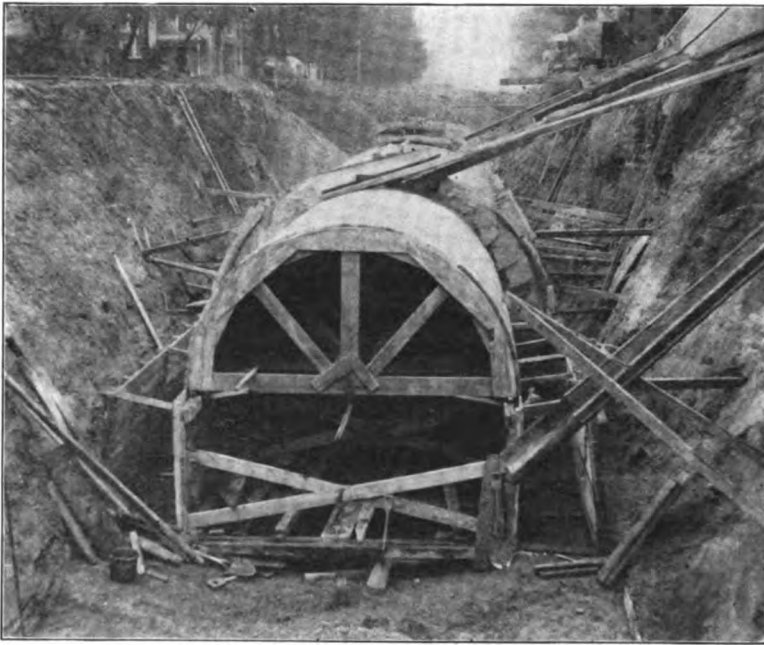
Construction of Dry-Run Concrete Sewer, Waterloo, Iowa.
